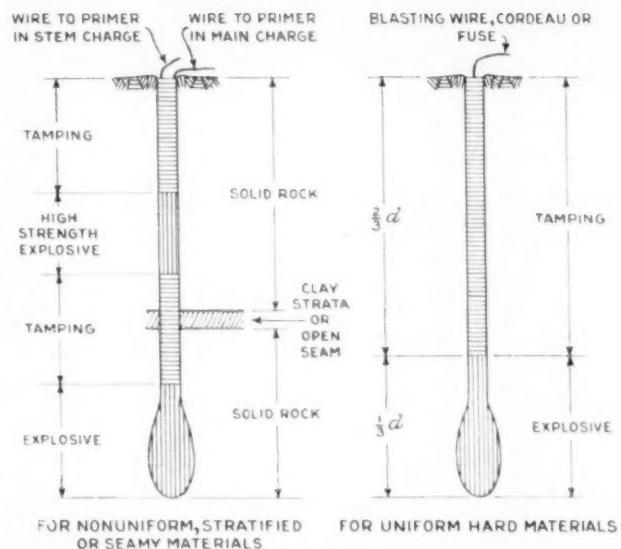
SUGGESTIONS FOR LOCATING THE BLASTING CHARGE. HOLES SHOULD BE SPRUNG UNTIL THE DESIRED AMOUNT OF EXPLOSIVE WILL NOT OCCUPY MORE THAN ONE-THIRD OF TOTAL DEPTH. IN MATERIAL WHICH IS HARD TO SHATTER PROPERLY, A SMALL CHARGE OF HIGH-STRENGTH EXPLOSIVE SHOULD ALSO BE PLACED IN THE STEM WHENEVER THE DISTANCE TO THE NEAREST HOLE EXCEEDS 8 FEET. NO STEM CHARGE SHOULD HAVE LESS THAN 2 FEET OF TAMPING OVER IT
